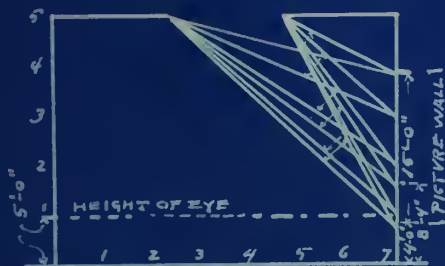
ARRANGEMENT OF WALL LIGHT (AFTER MAHV)
